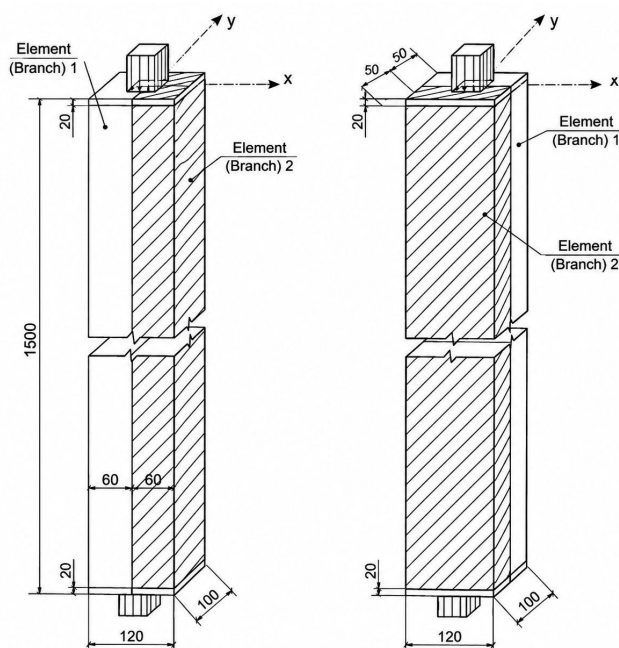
Cross-sectional configurations of Series K-I and K-II column specimens and compression testing schemes
